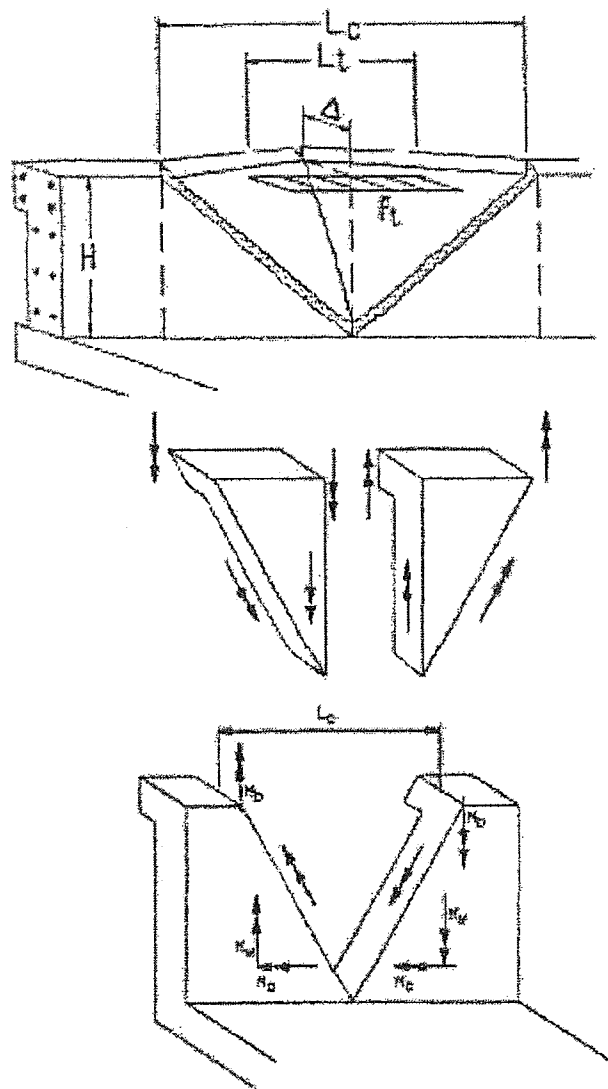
Yield Line Analysis of Concrete Parapet Walls for Impact within Wall Segment
